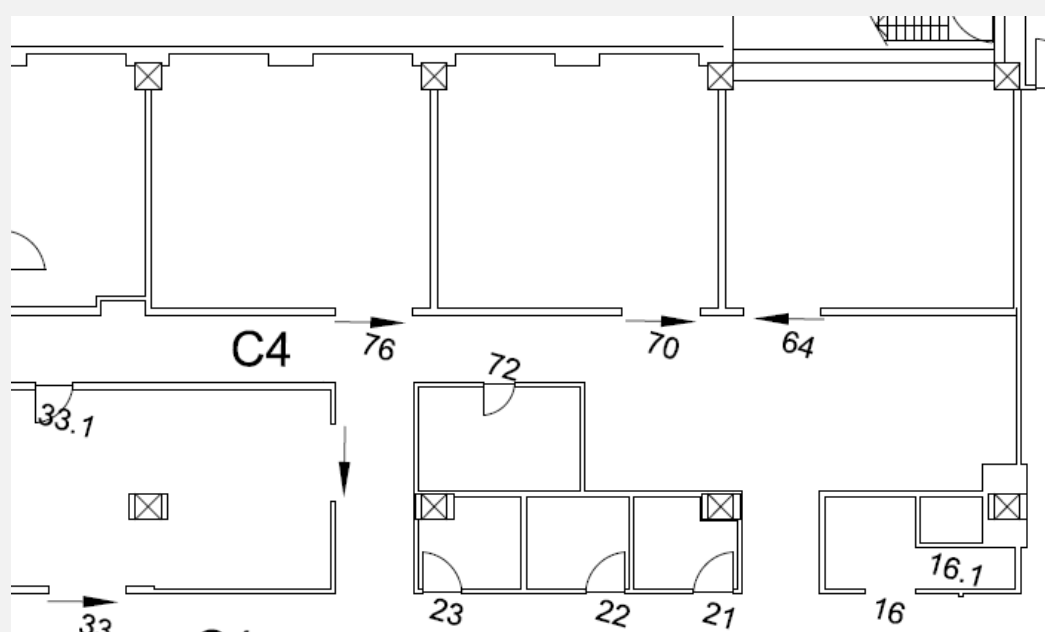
Floor plan of the existing layout within the Nuclear Medicine department that was allocated for the new PET/CT facility.
